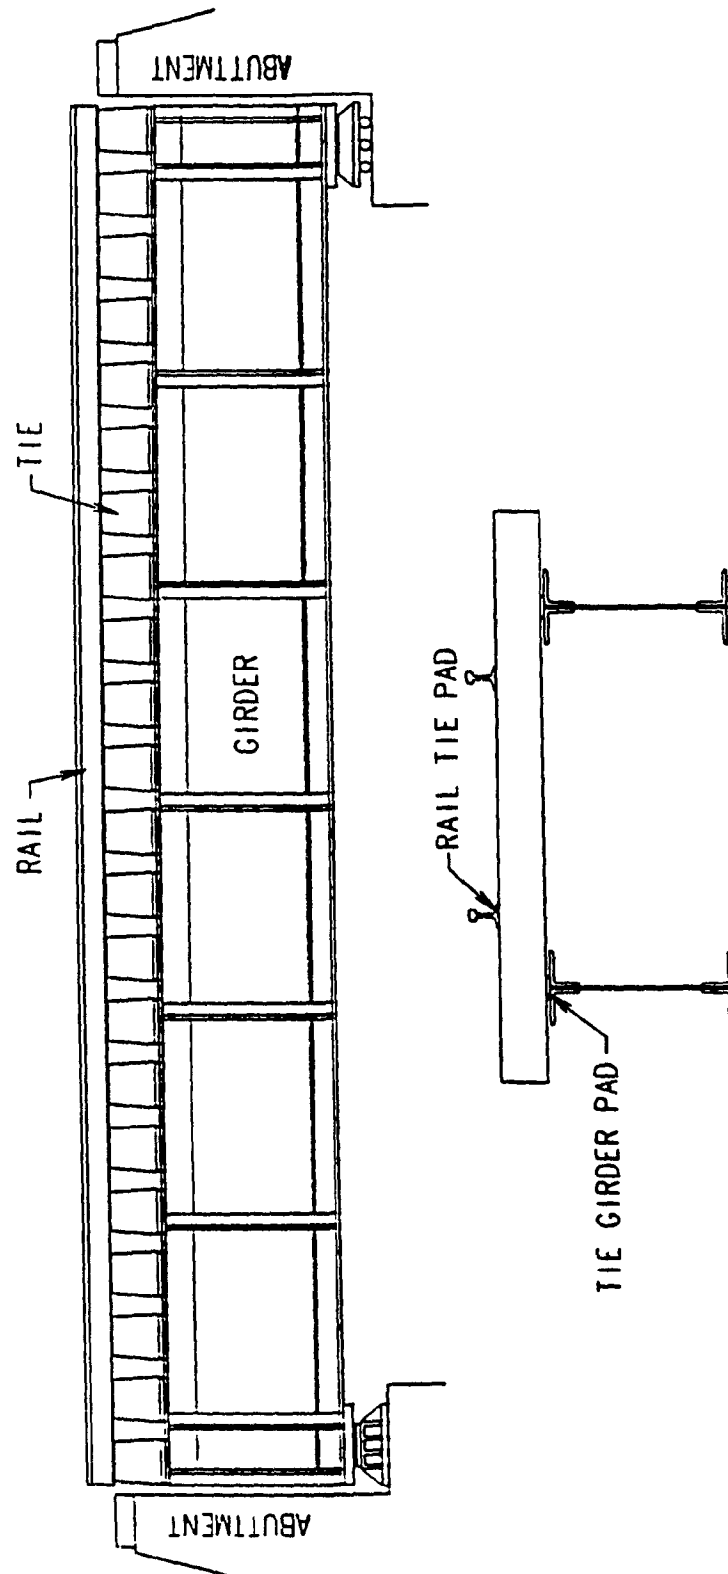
Diagram of Short Span Open Deck Railway Bridge
